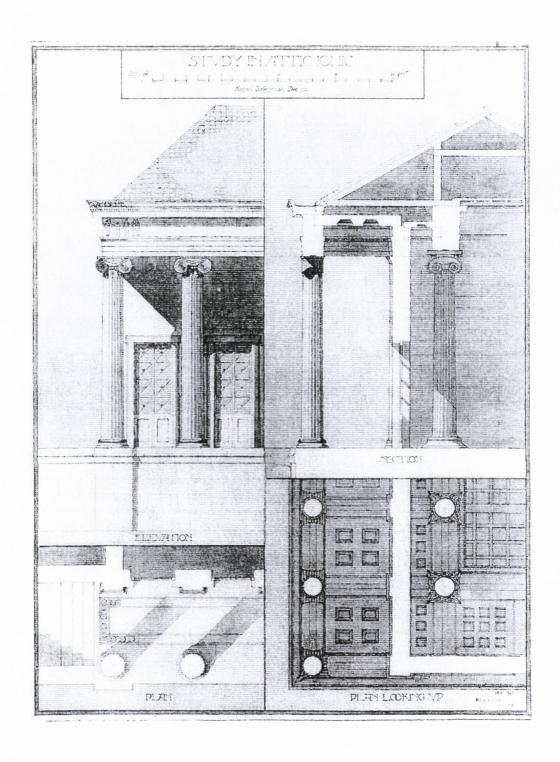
15. Michael Waterhouse, architectural drawings showing Bassai Ionic columns, 1913.
